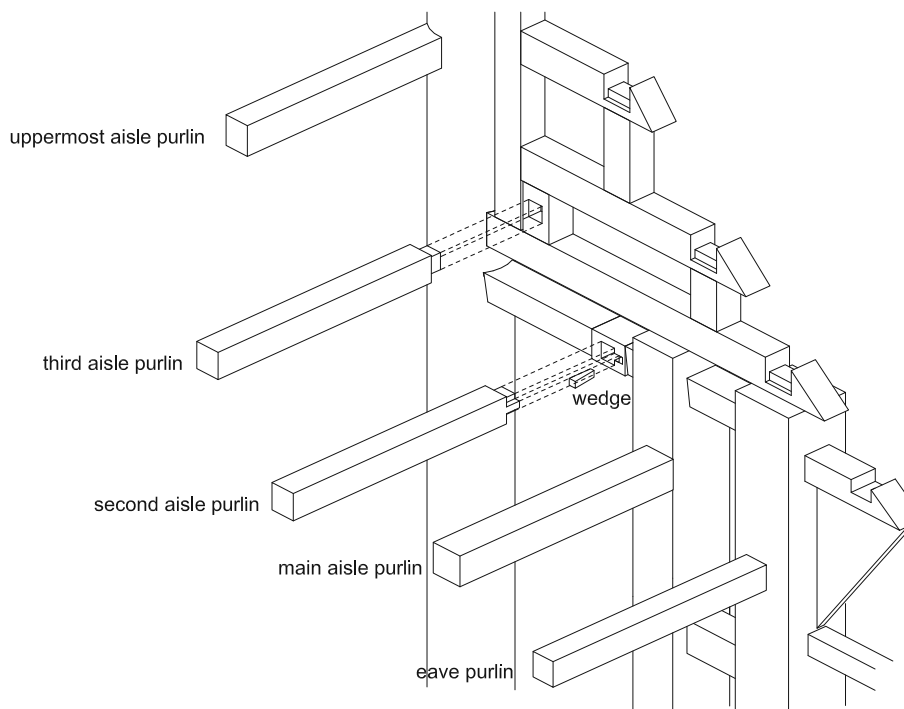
Purlins from the first bay meeting the second transverse frame in aisle roof
